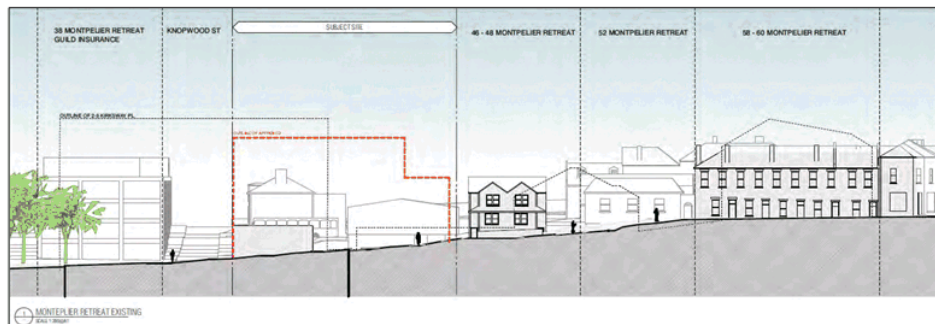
Montpelier Retreat section and site location (back) (source: FK Architects)
